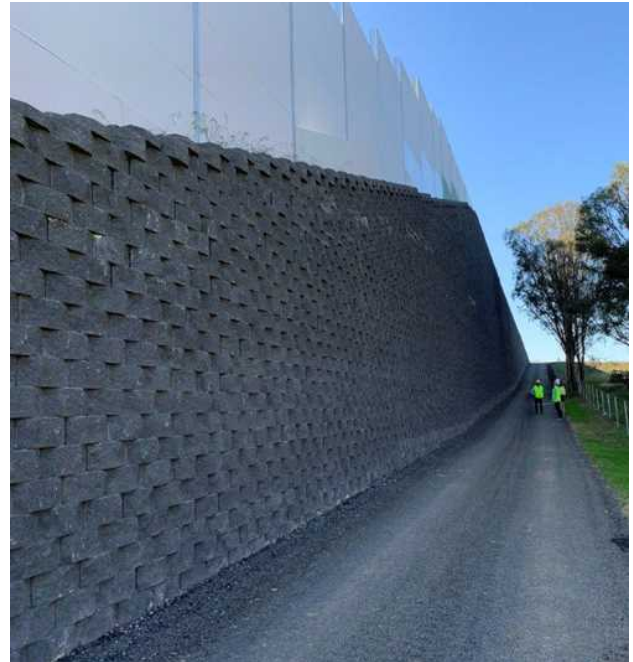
Completed Keystone TW3 wall with noise barrier wall on top
